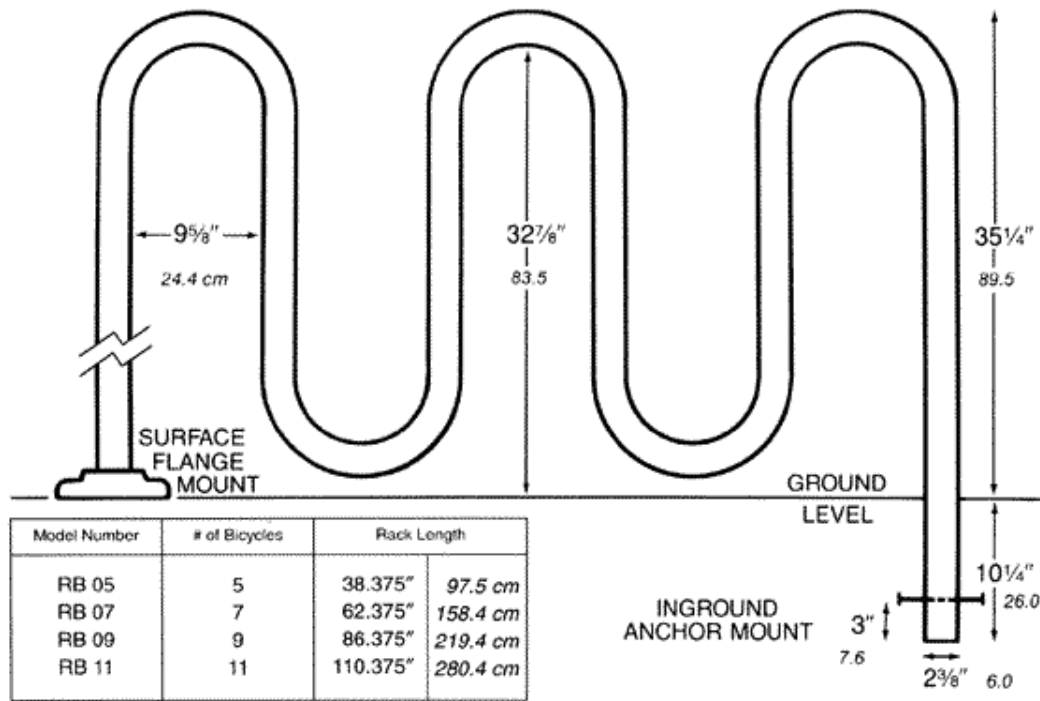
Ribbon Rack Surface Flange Mount Method.
